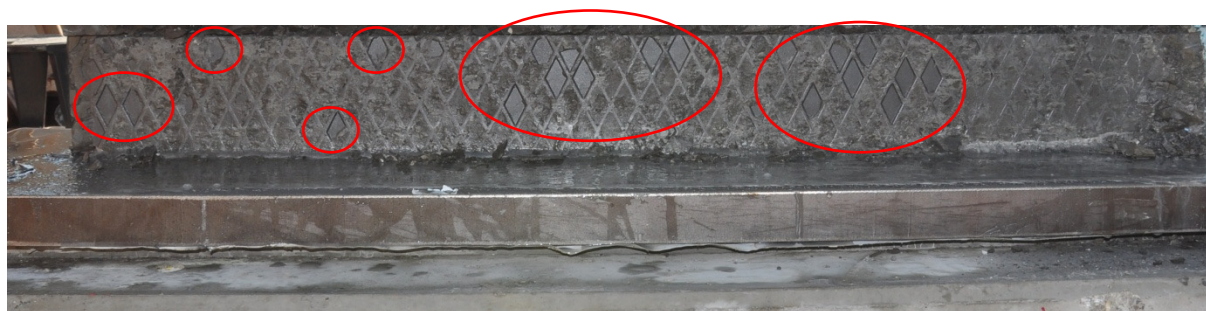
Combined bearing-shear failure of interface. Specimen PR100\_6
